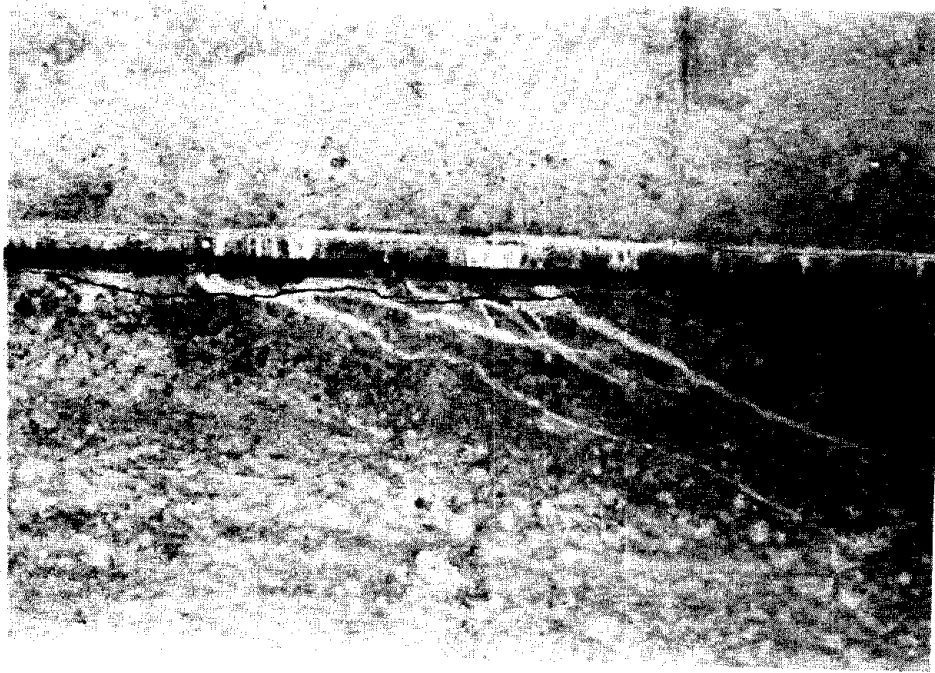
Typical crack caused by corrosion of a prestressing strand.
